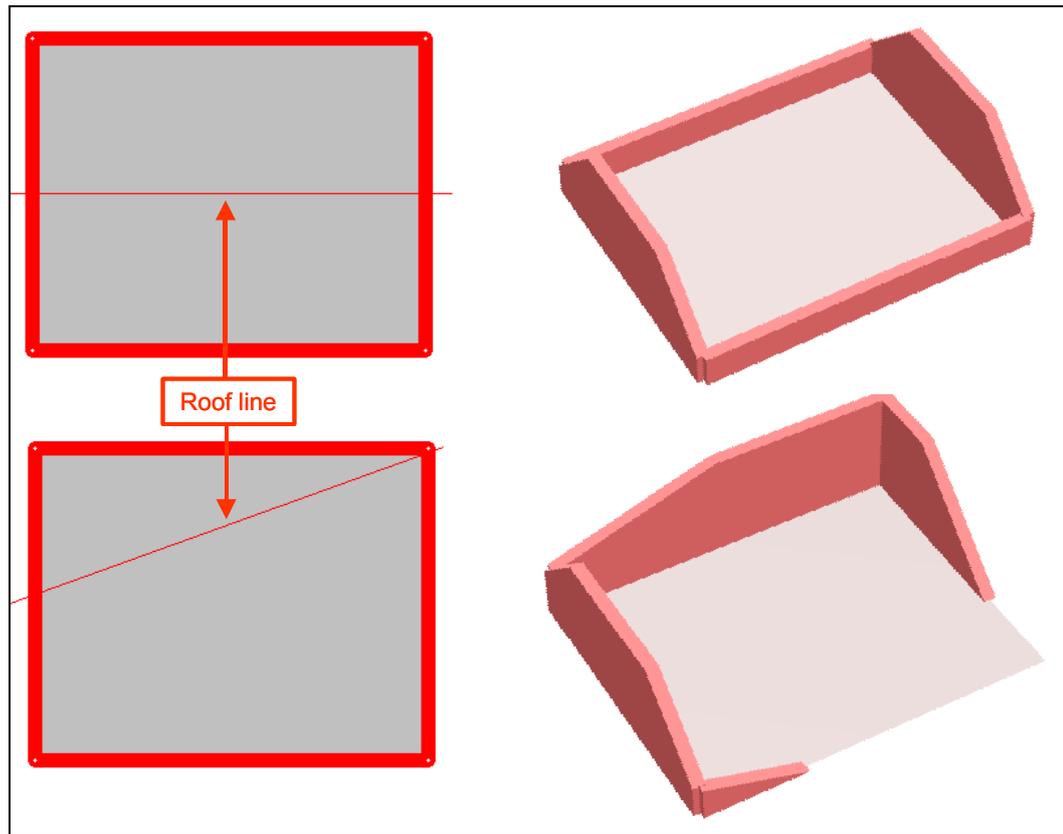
Drawing a roofline on a floor plan and its effect on the floor walls
